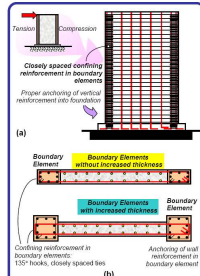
Layout of main reinforcement in shear walls as per IS:13920-1993 – detailing is the key to good seismic performance.
